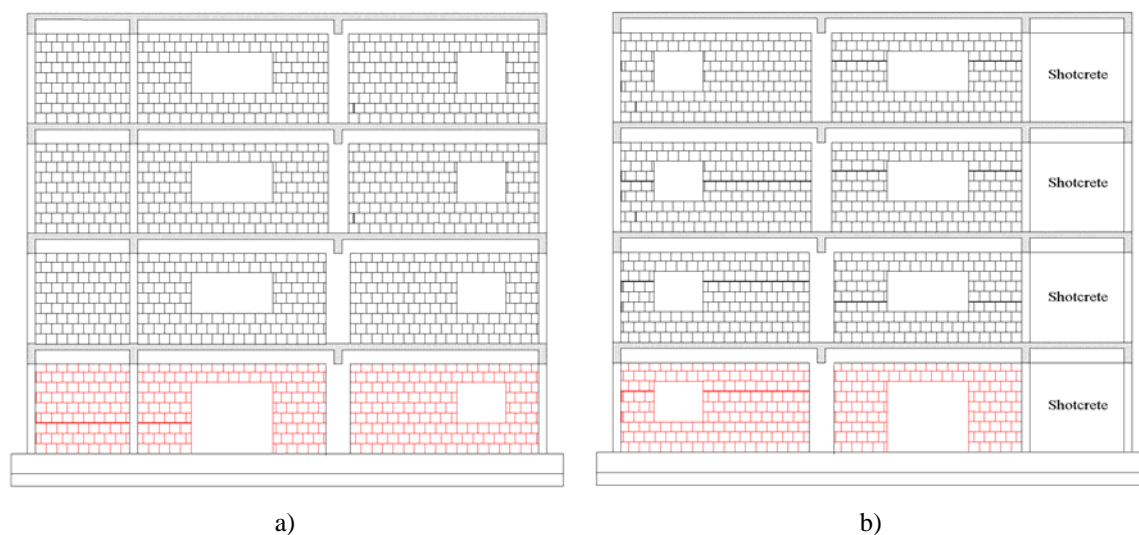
Reconstruction of the 1<sup>st</sup> storey infill panels and infill strengthening (shotcrete) of the short external bay at all storeys (elevation): a) south view; b) north view
